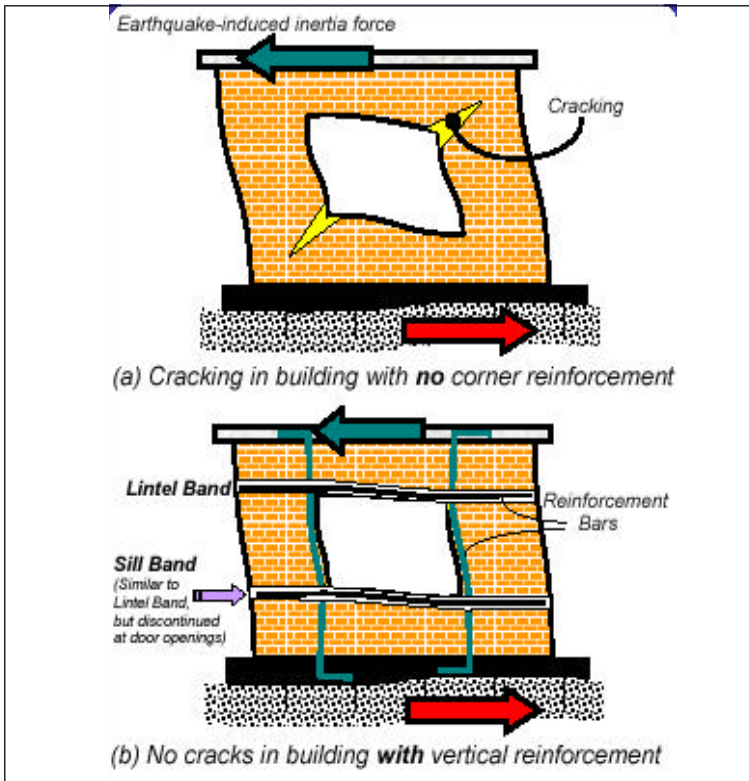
Cracks at corners of openings in a masonry building – reinforcement around them helps.
